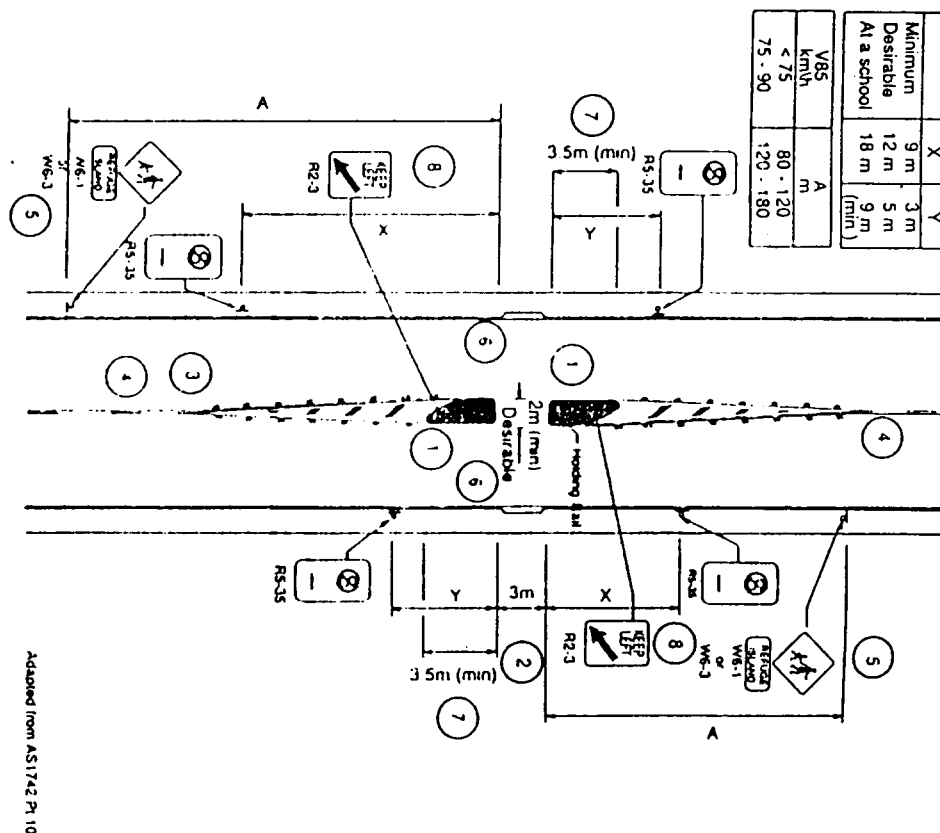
TYPICAL LAYOUT OF PEDESTRIAN REFUGE ISLANDS
